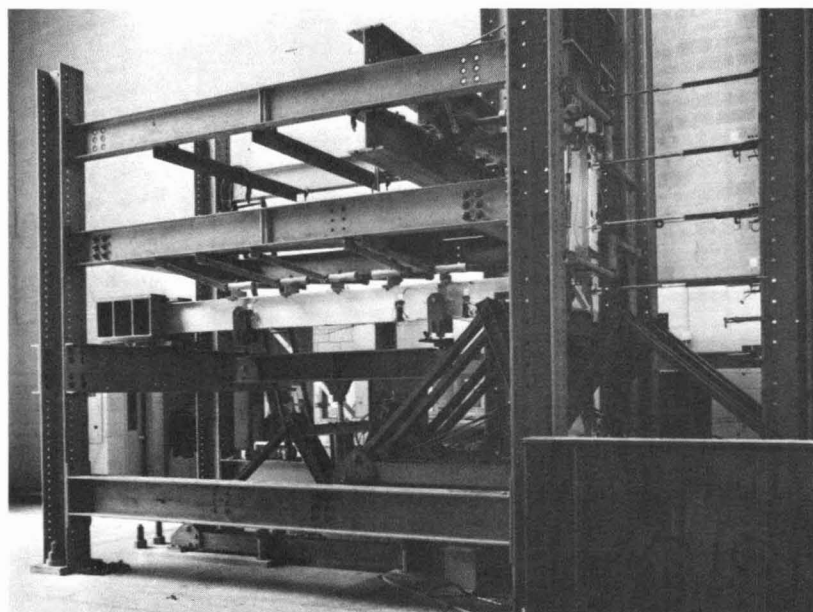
OVERALL VIEW OF TEST SETUP FOR TEST SPECIMENS RC-1 AND RC-3
